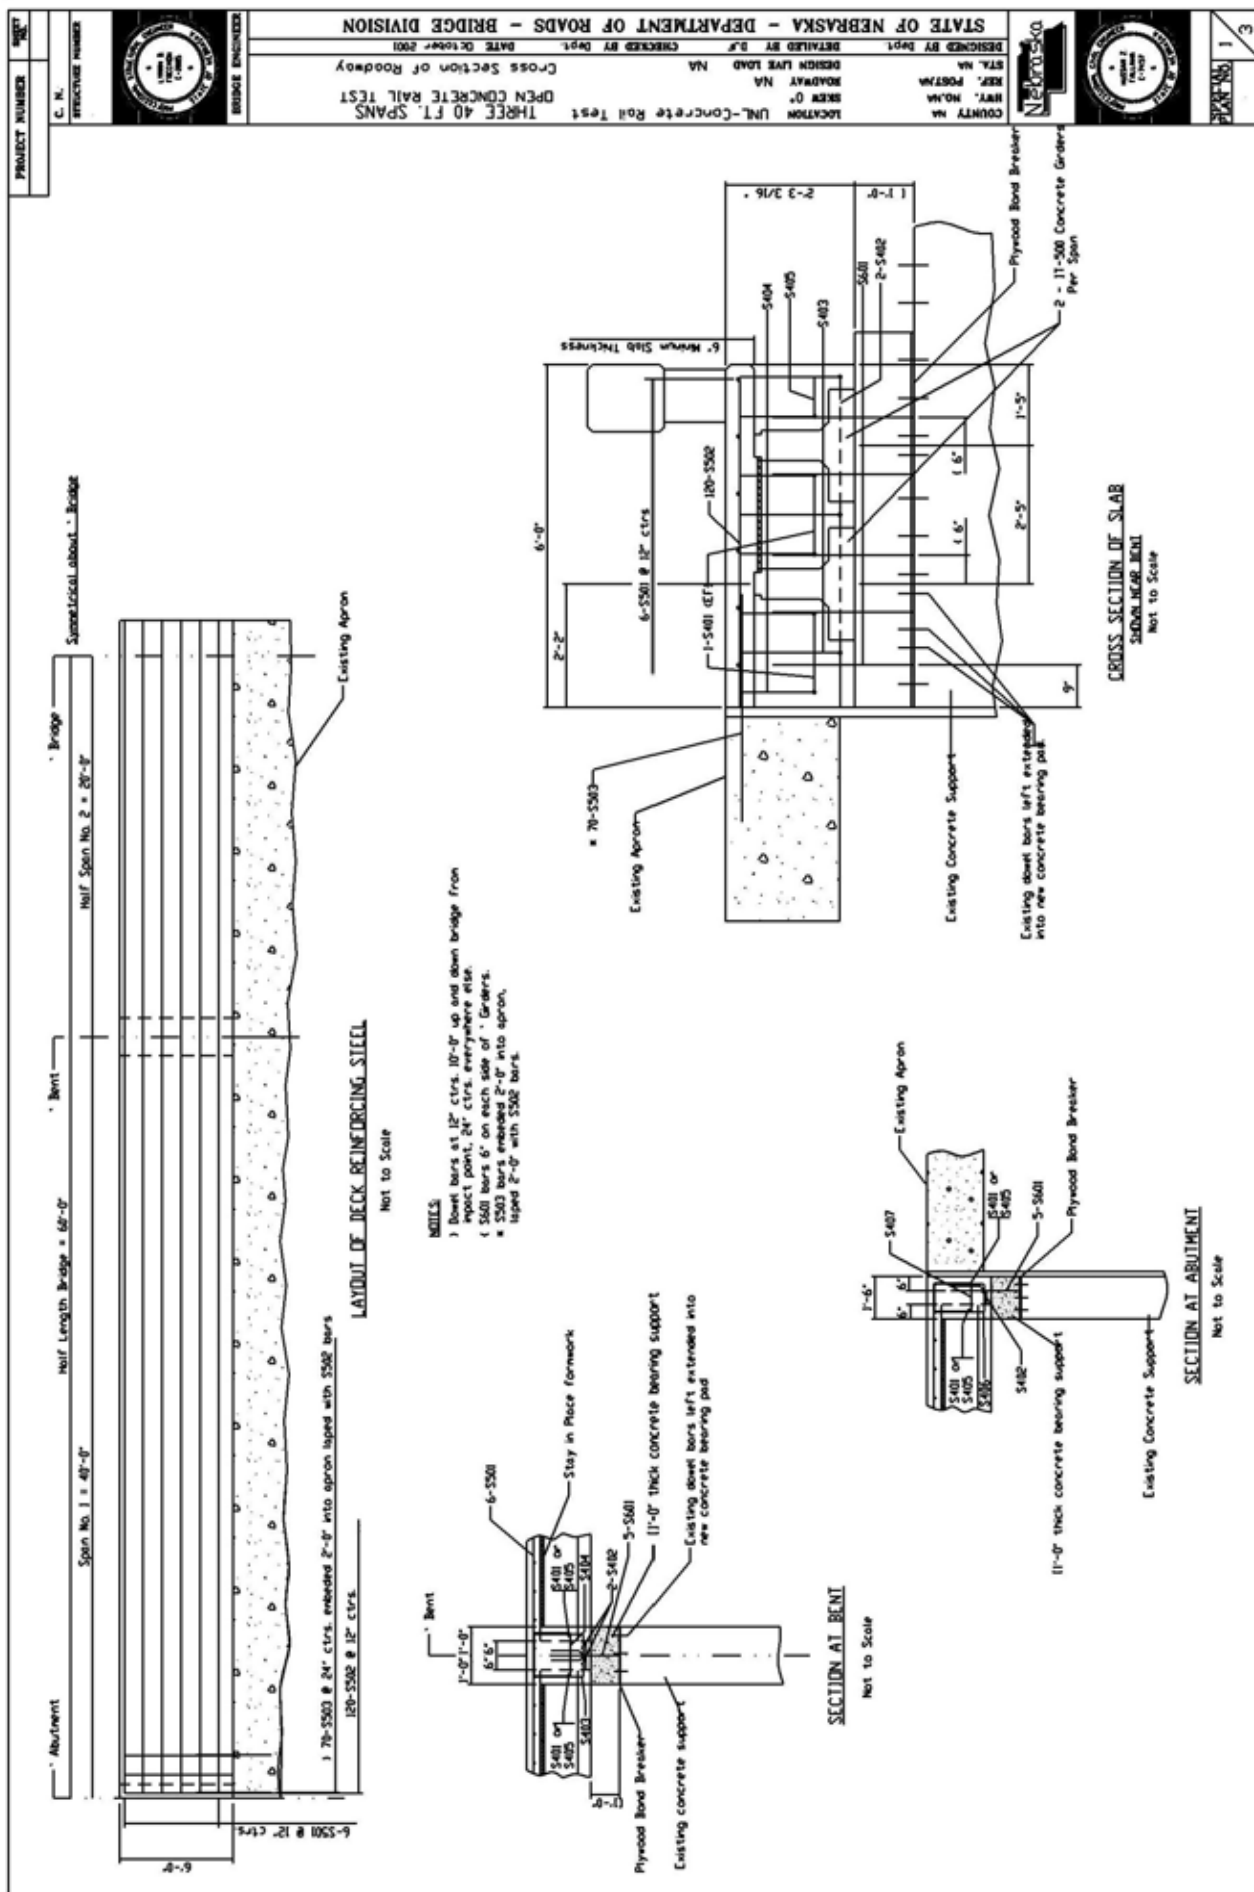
NDOR's Bridge Deck Standard Plan (English)
